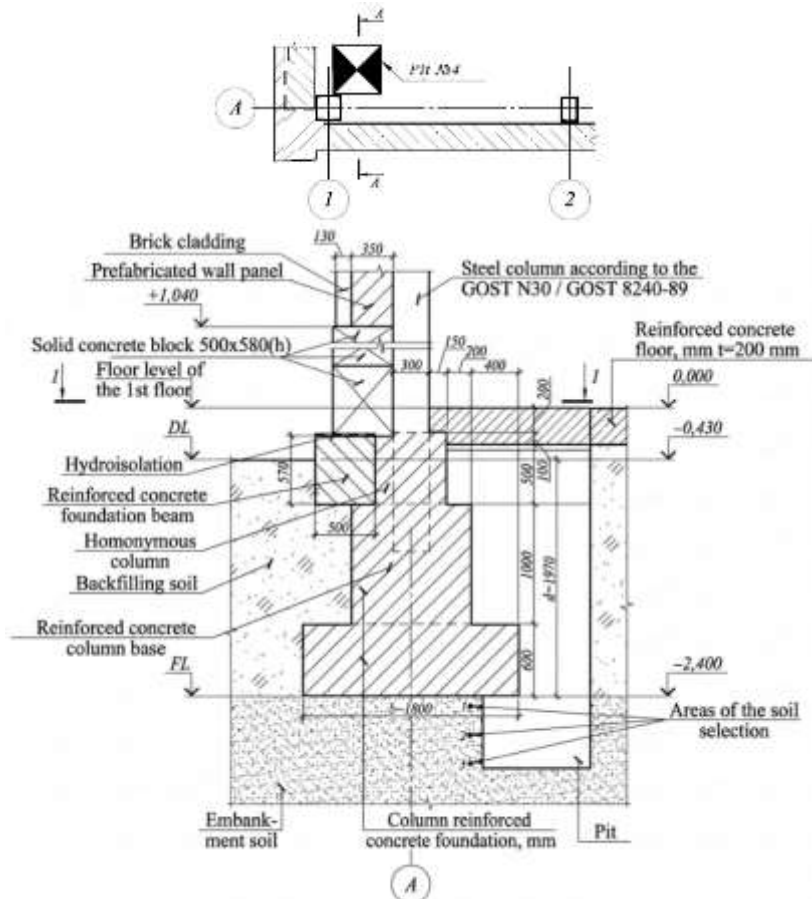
Scheme of the layout of the pit No. 4 and section A-A
